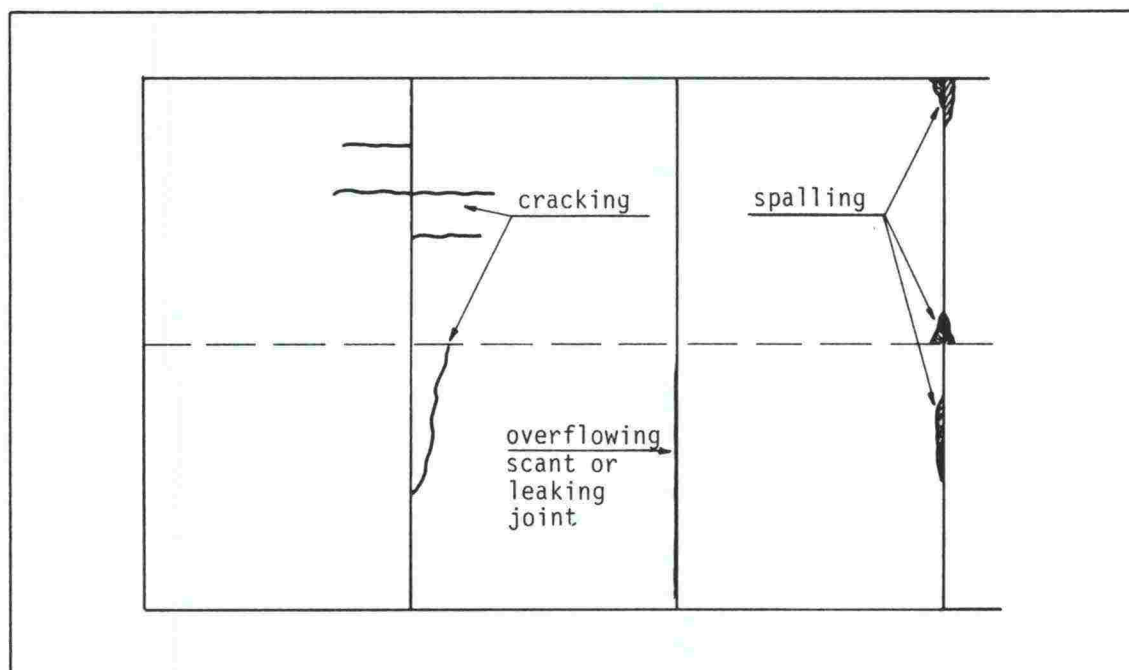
b. The most common joint defects of concrete pavements
